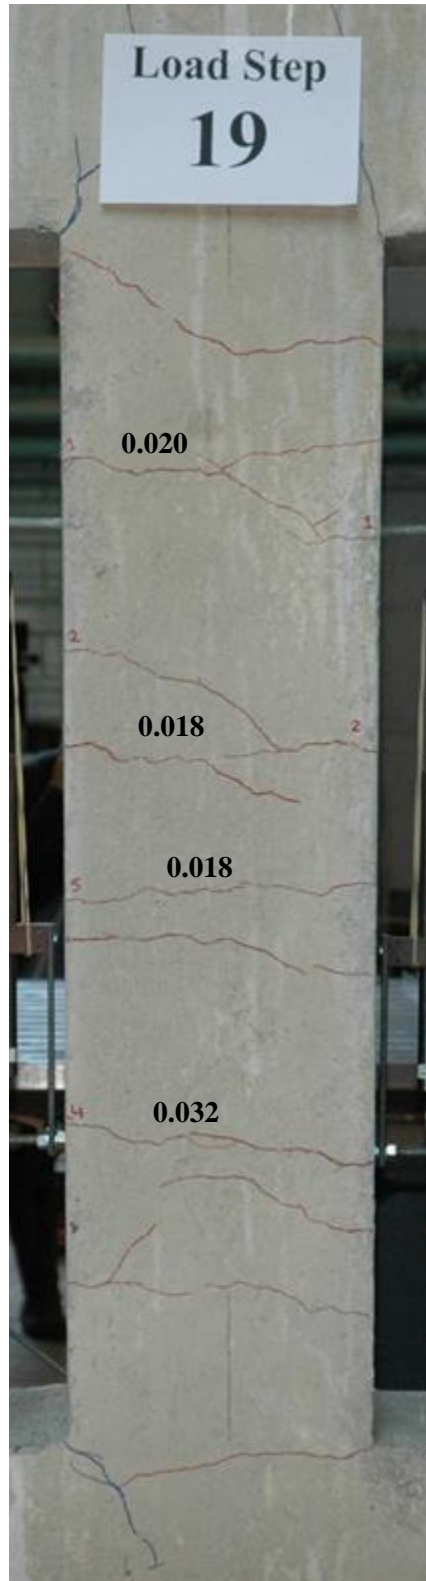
Cracks on west face of TS02 at Load Step 19
